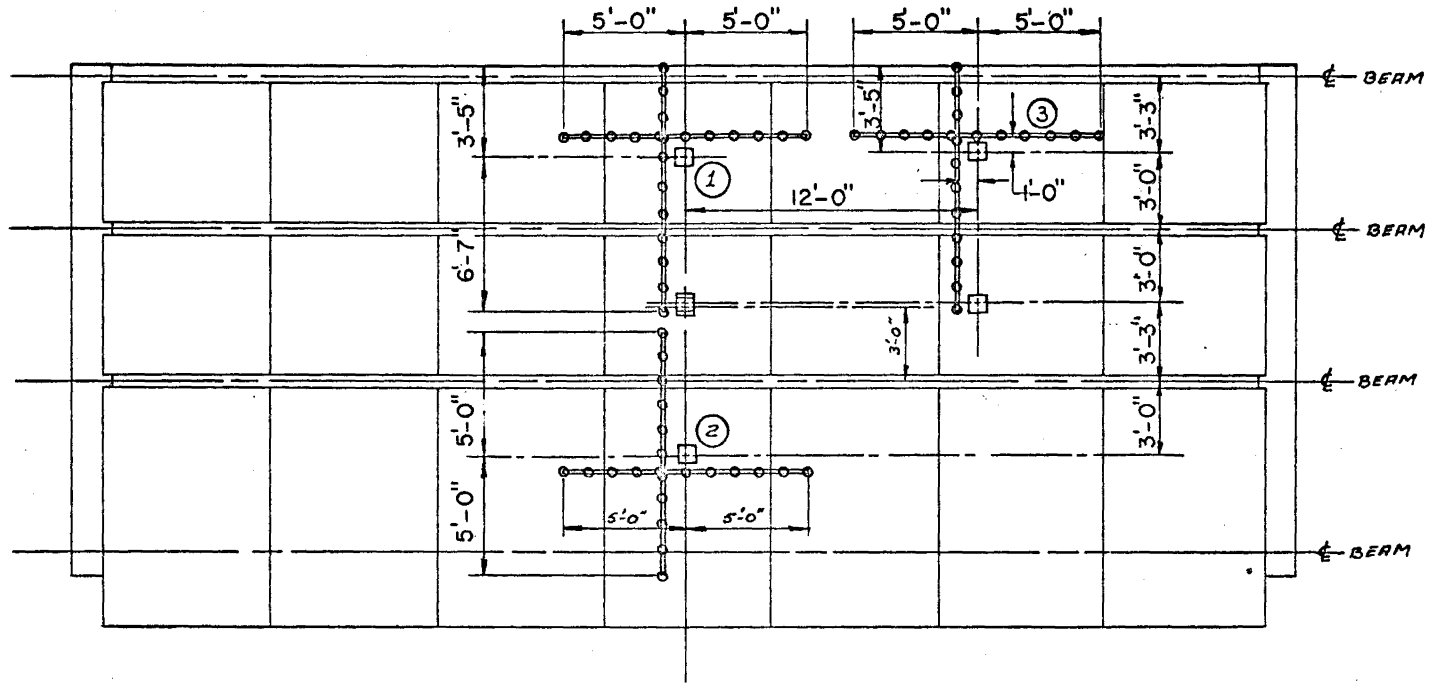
Bridge slab surface contour gage positions for loadings 1, 2, and 3
